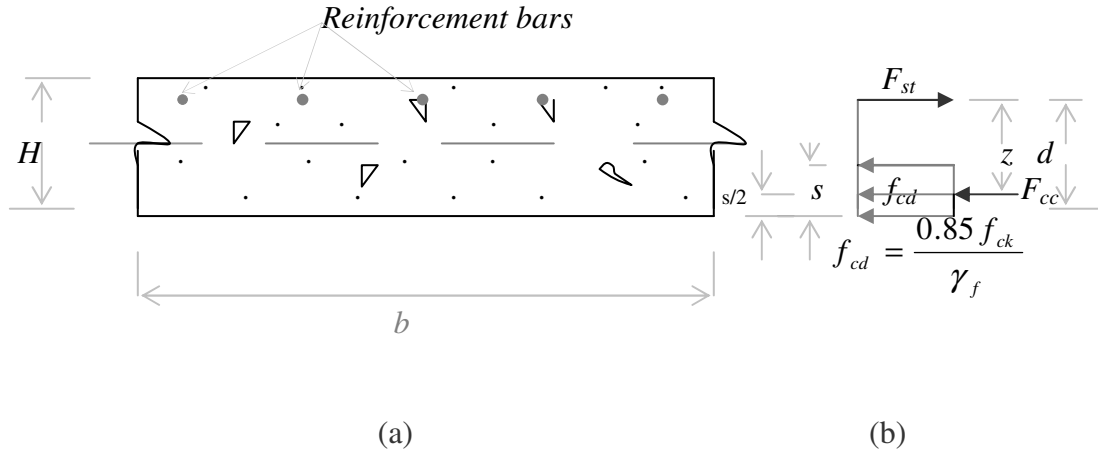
(a) assumed cross-section of the slab with negative reinforcement
